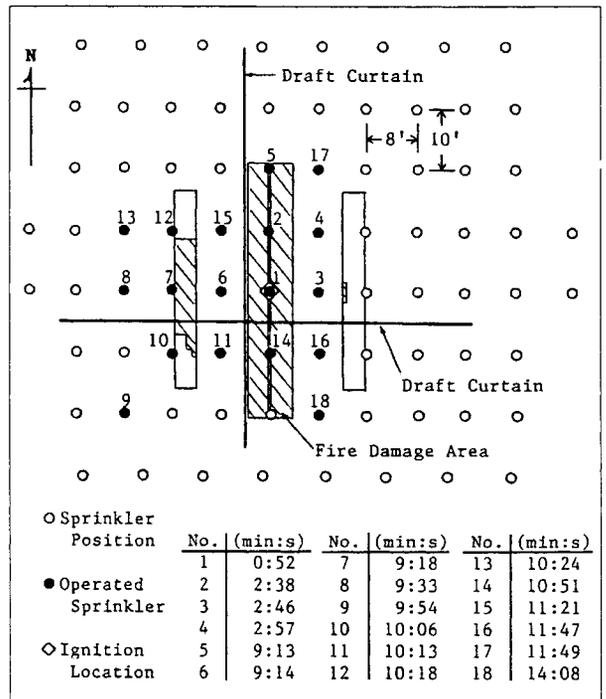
Sprinkler Operations and Overall Extent of Fire Damage - Test 7.
